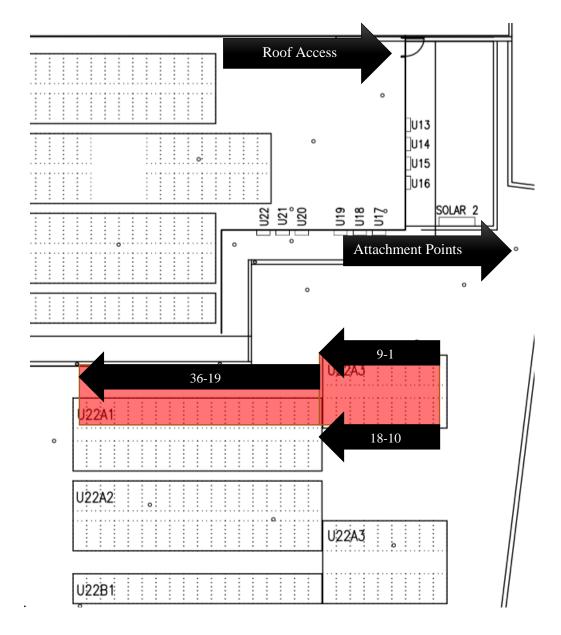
Zoom of layout (Red) indicating the 36 panels scanned, access and attachment points (Appendix B full size).
